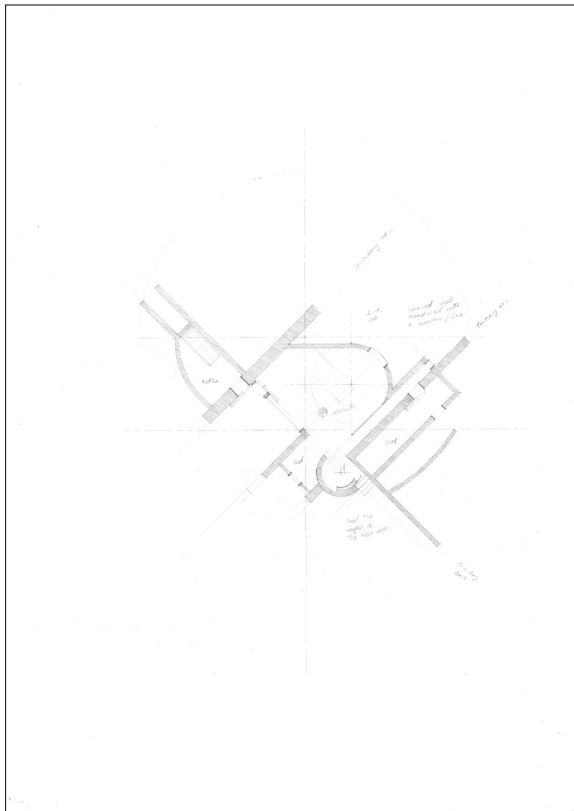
House plan as the genesis for the subsequent roof plan, where roof elements from the section are overlaid.
